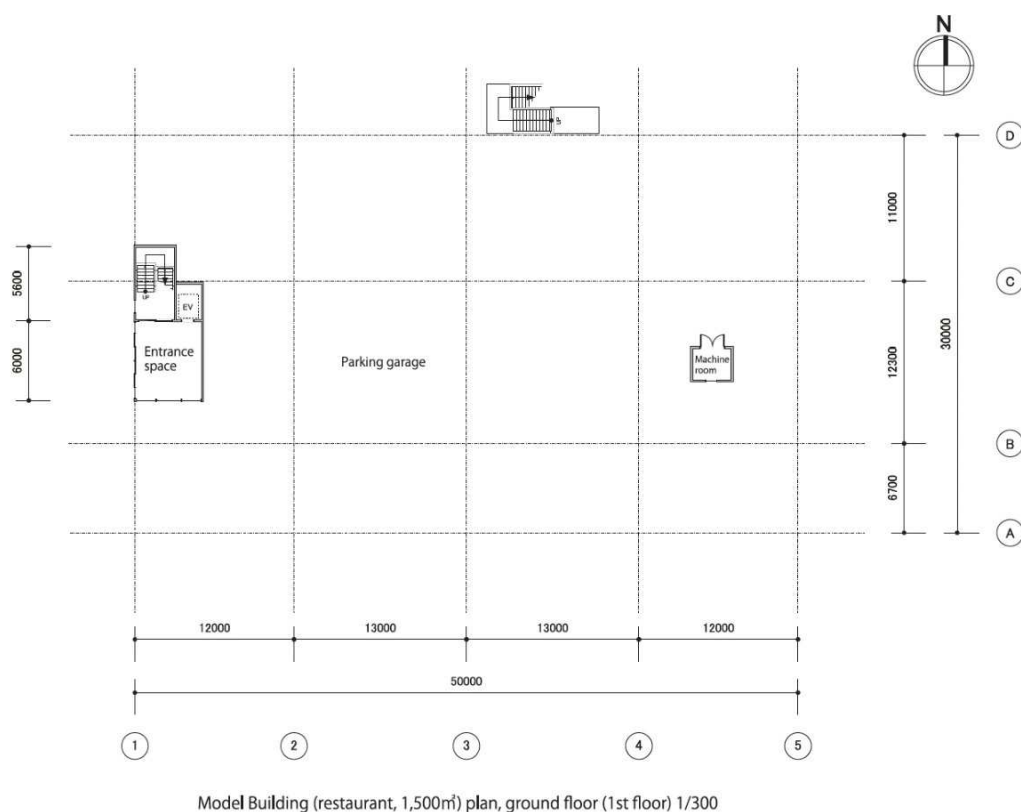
Model building (restaurant, 1 500 m²) plan, ground floor (first floor) 1/300
